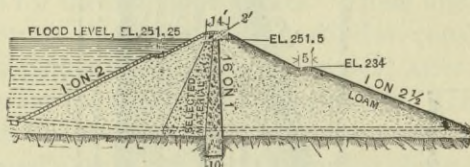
CORE-WALL AND EARTH EMBANKMENT, BOSTON WATERWORKS.
